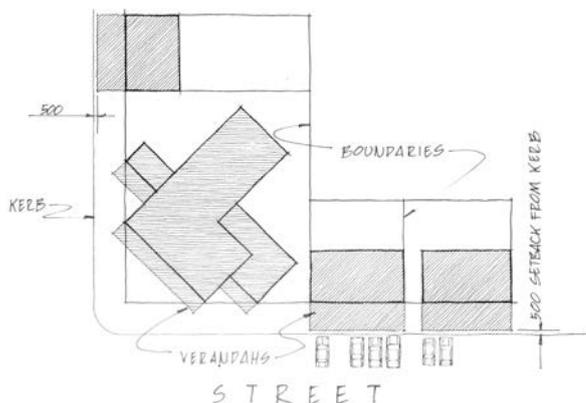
Plan view showing siting, and front and side boundary setbacks. New development within the Rangiriri Heritage Precinct must align with the existing buildings in order to preserve the overall appearance and rhythm of the streetscape. Note the position of verandahs in relation to the streetfront lot boundaries and roadside kerb.
